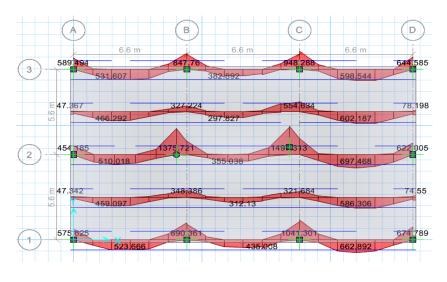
Along longer side reinforcement(SAFE:EC2, with staggered column)
